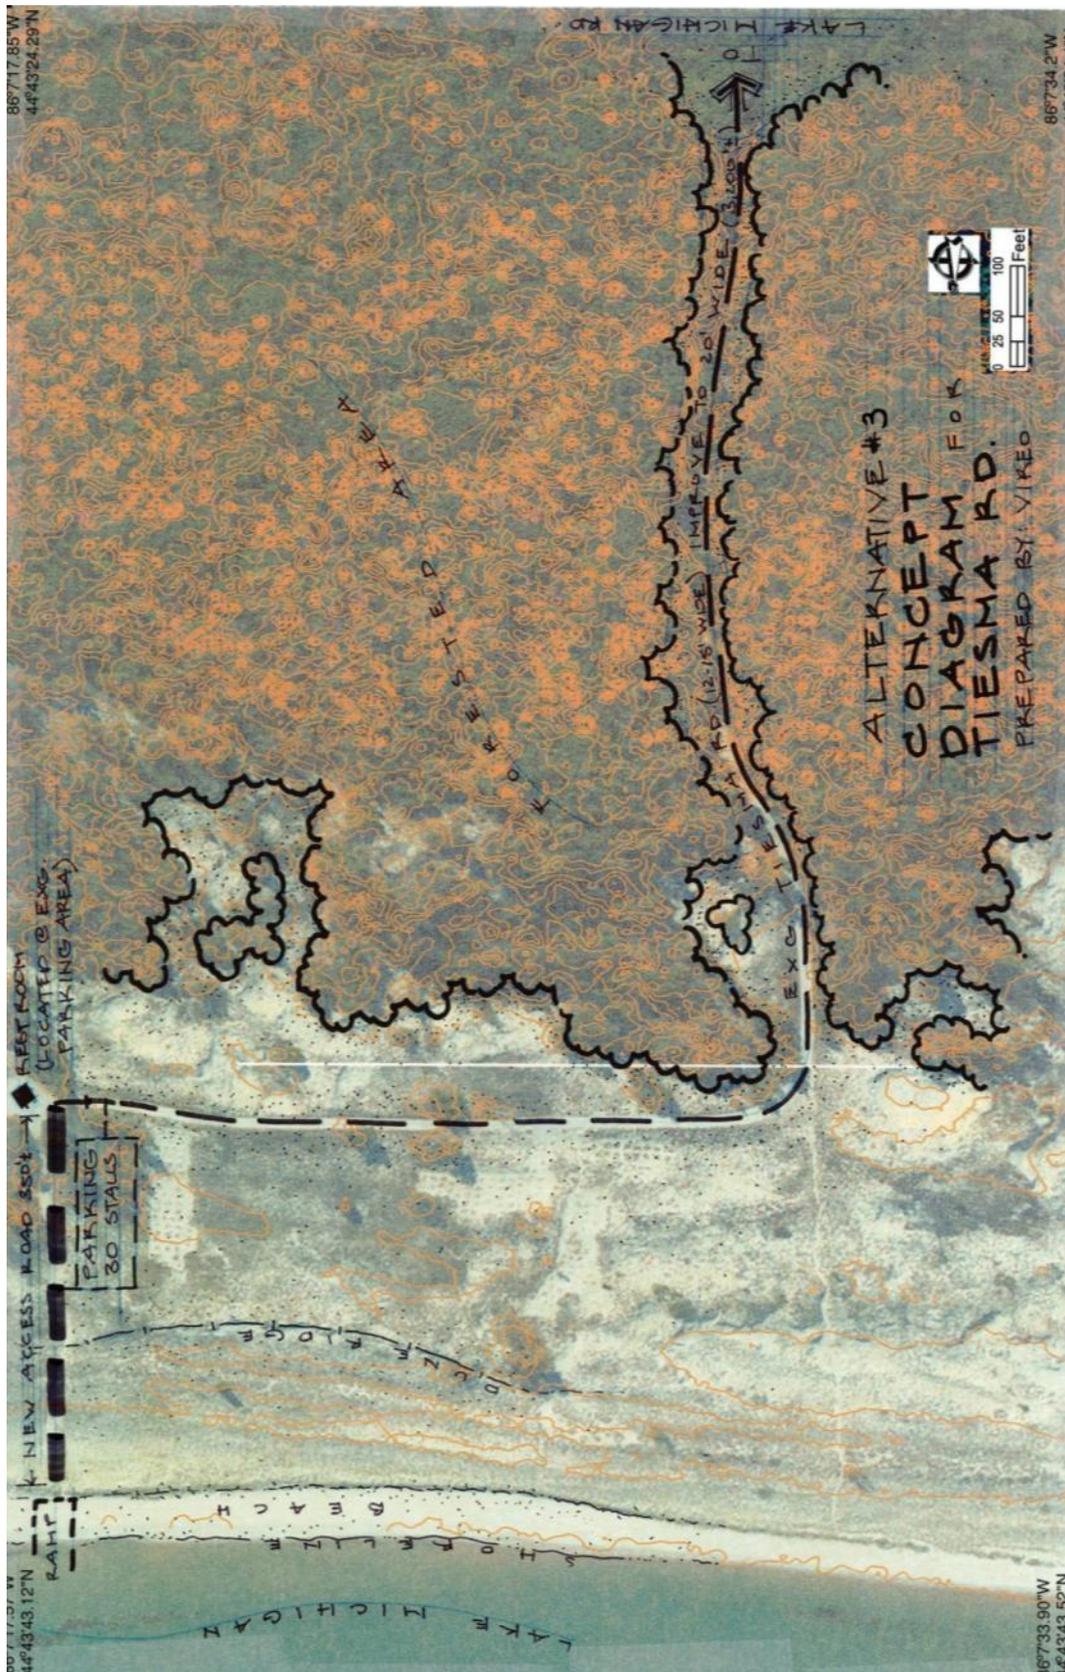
Conceptual plan for new recreational boat access to Platte Bay at Tiesma Road (SFS Architecture/Vireo 2014; aerial photograph USDA 2013).
